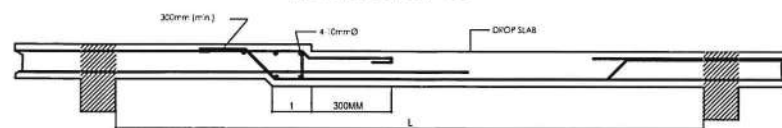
TYPICAL DETAIL OF DROP SLAB
